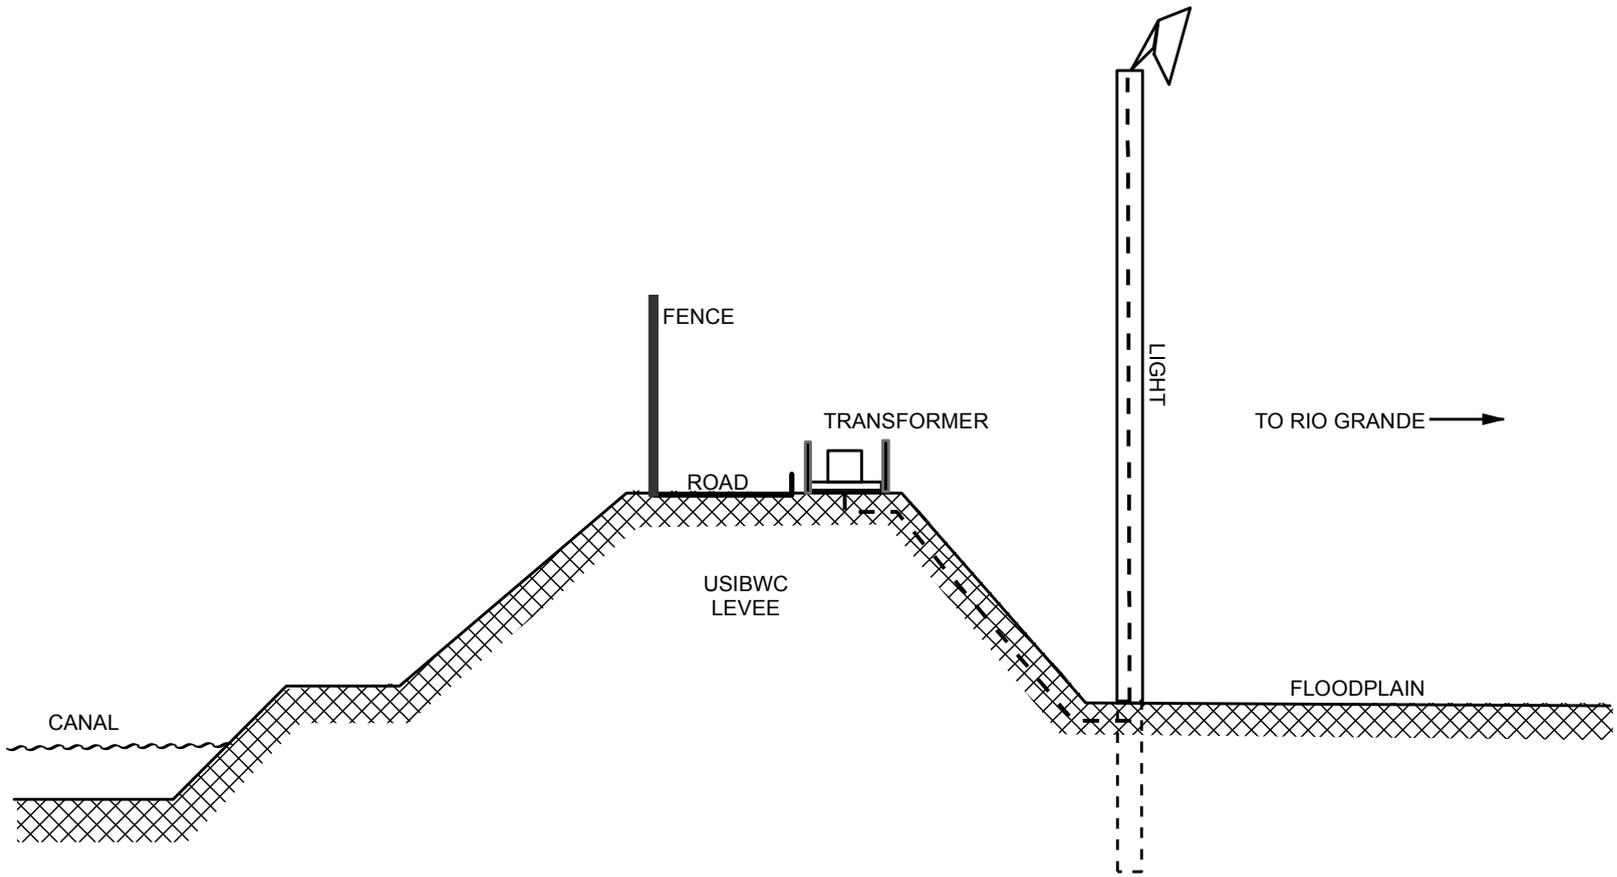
Typical Schmatic Cross Section, Floating Foundation Fence
